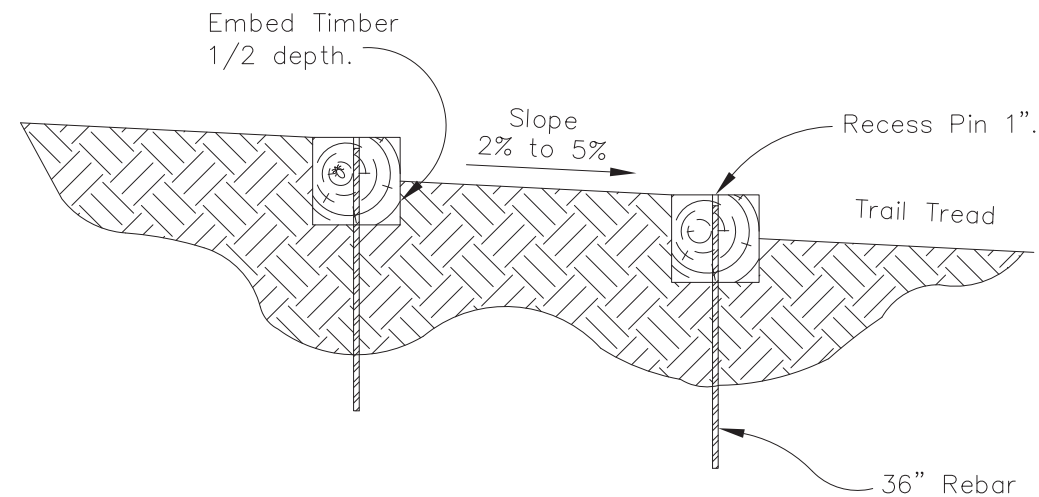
Cross section view of an embedded timber trail step system. This type of step system will be installed on the hill section of trail.
